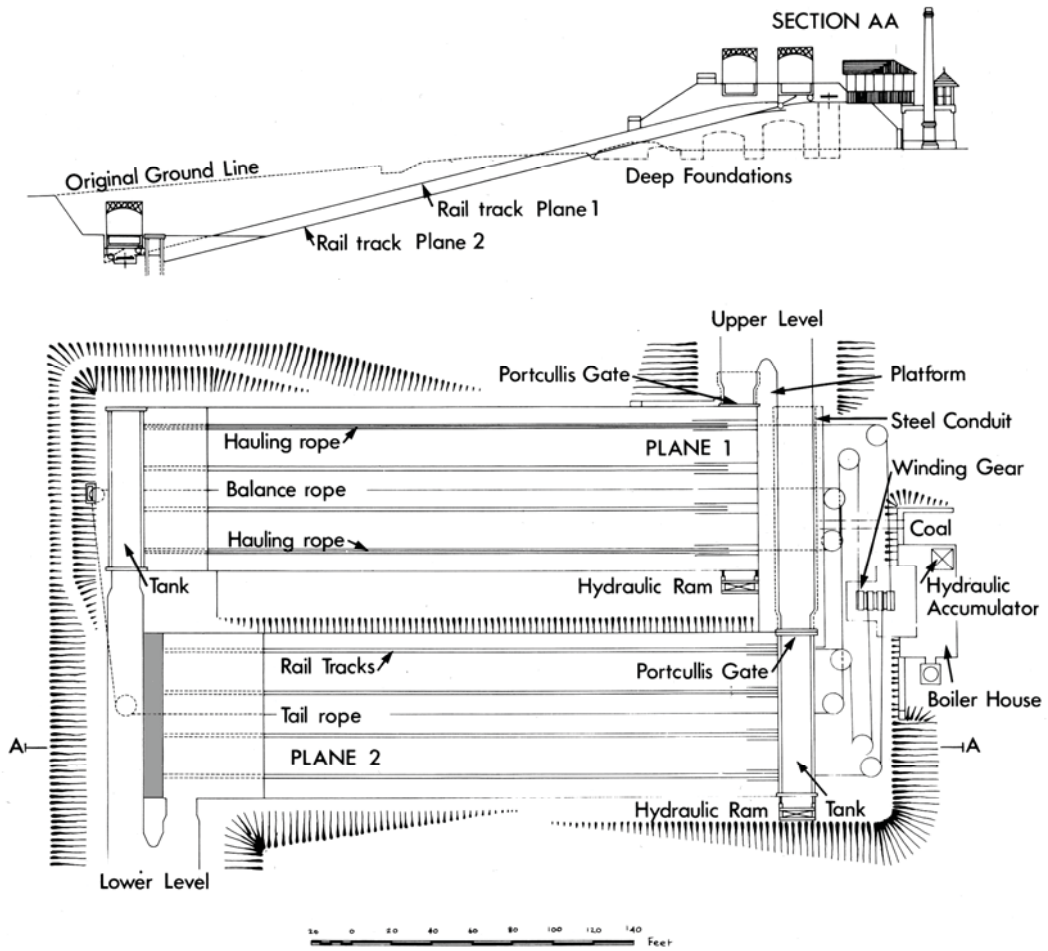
Plan of the Incline Plane (after Gardner and Foden 1978, Fig 4). Timber walkway shaded grey. (Appendix 1)
